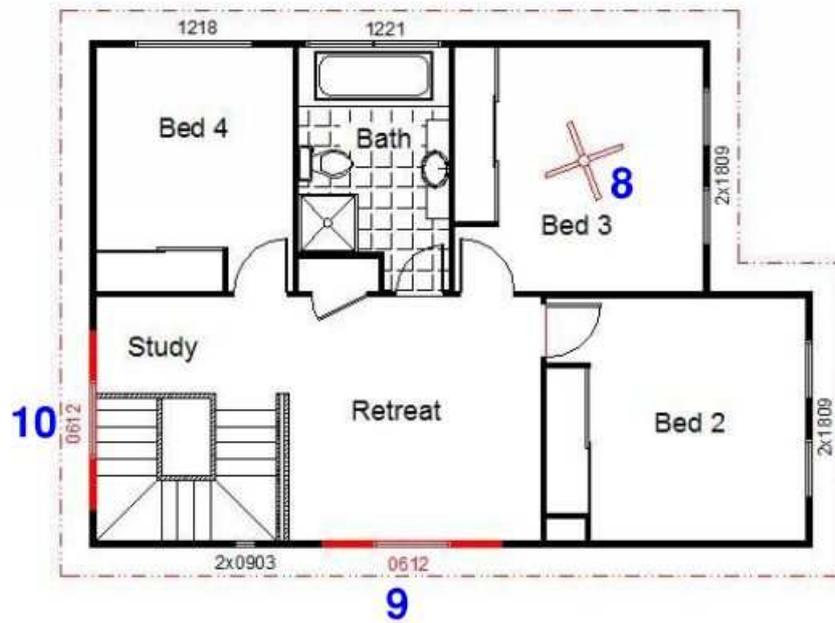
Redesigned first floor plan for Dwelling 9 in Darwin.
